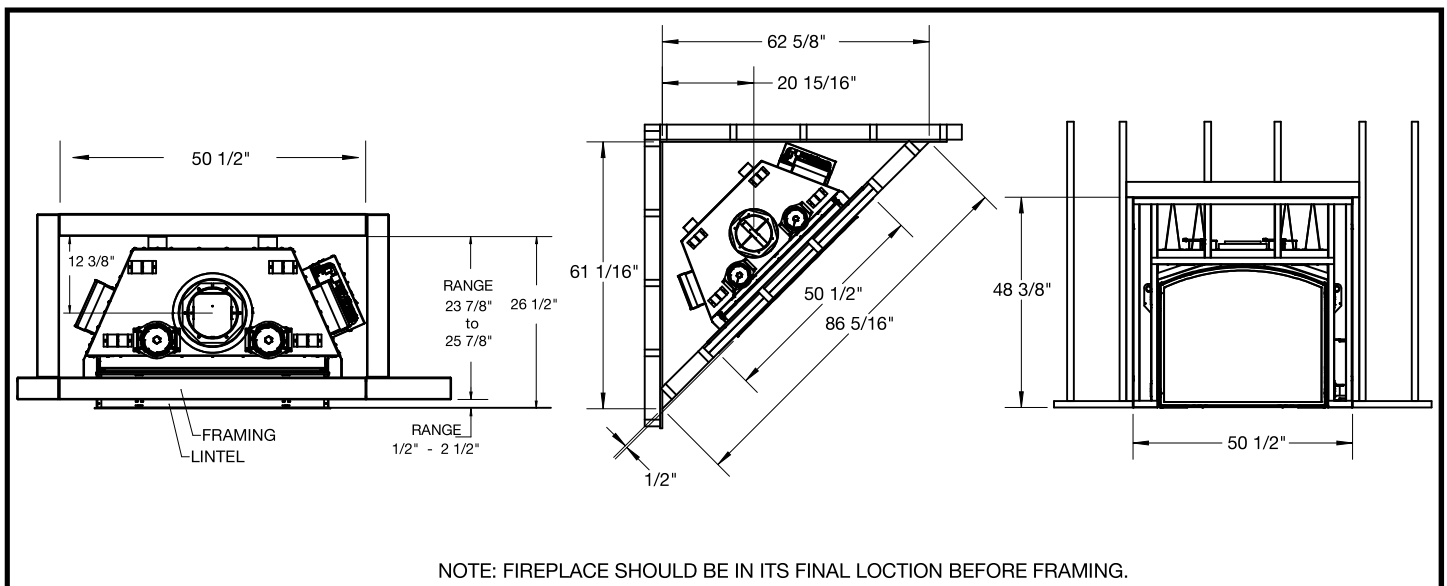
TC 36D Arch Minimum combustible framing dimensions.
